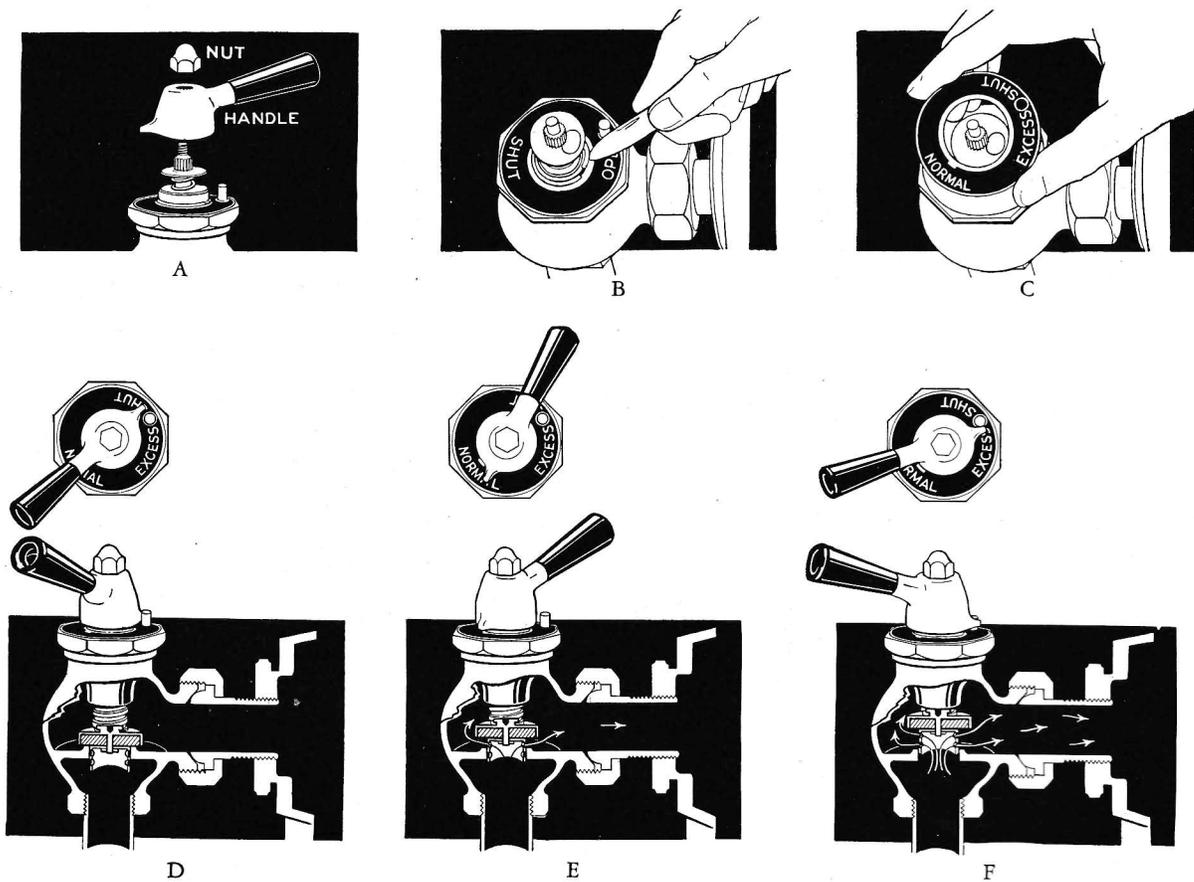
The Webster "Three-Point" Valve is usually shipped from the factory as a standard supply valve. To utilize the "Three-Point" feature it is necessary to (1) shut the valve, (2) remove nut and handle as in A, (3) pry off spring ring as in B, (4) reverse dial plate as in C and (5) replace spring ring, handle and nut, *making sure* to set handle at new shut position. The "Three-Point" settings now available are as shown in D, E and F. In D the valve is SHUT. In E it is open to NORMAL position, giving enough heat for the comfort of the average person. Note that steam is flowing through the top row of holes only. In F it is at EXCESS to supply added heat when desired. Note that steam now flows through two rows of holes.
